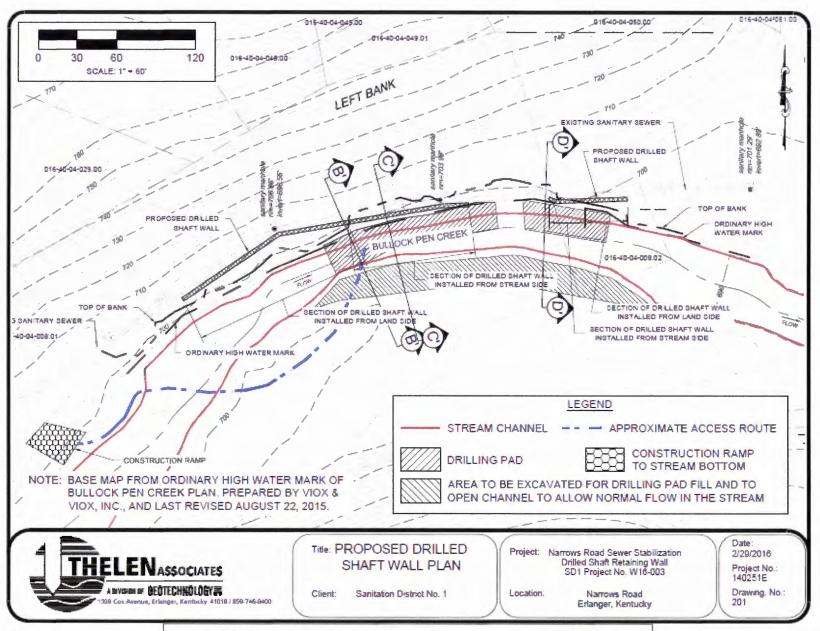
Design plan for the Narrows Road Sewer Stabilization Project, showing the new channel of the rerouted section of Bullock Pen Creek
